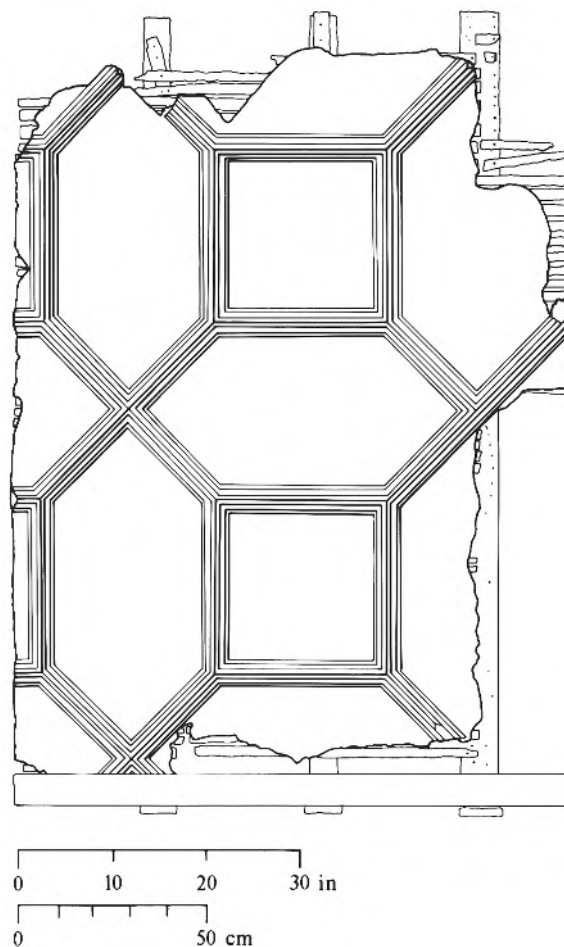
Section of narrow-rib plaster ceiling from first floor room, west addition (1:20)
